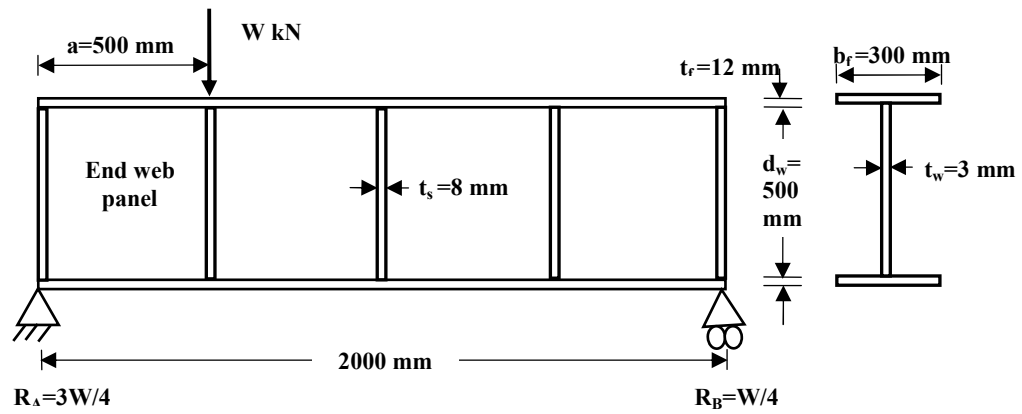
Dimensions, loading and boundary conditions of steel plate-girder
